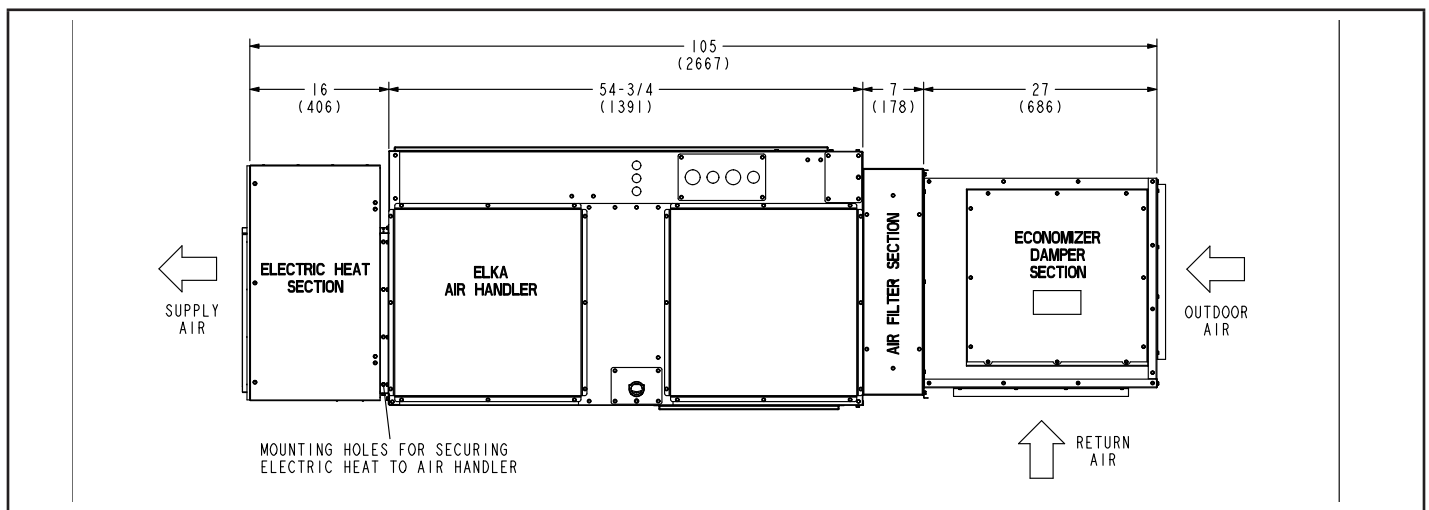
ELKA Horizontal Application – Dimensions – Inches (mm)
